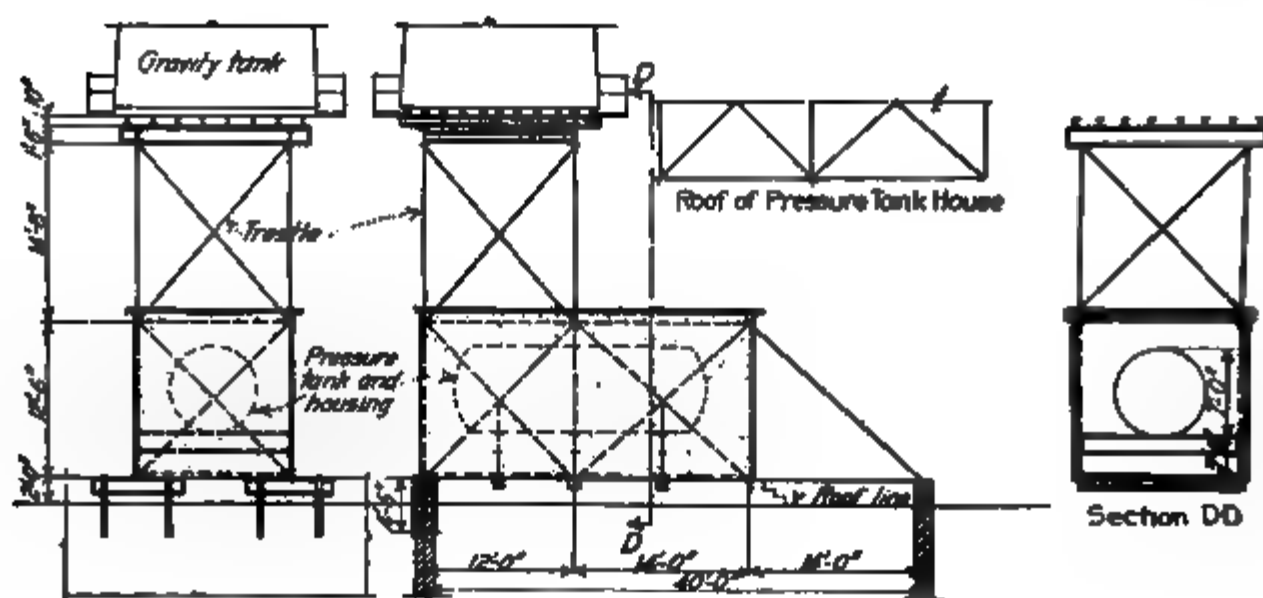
Sprinkler tanks supported by trusses spanning from wall to wall.
